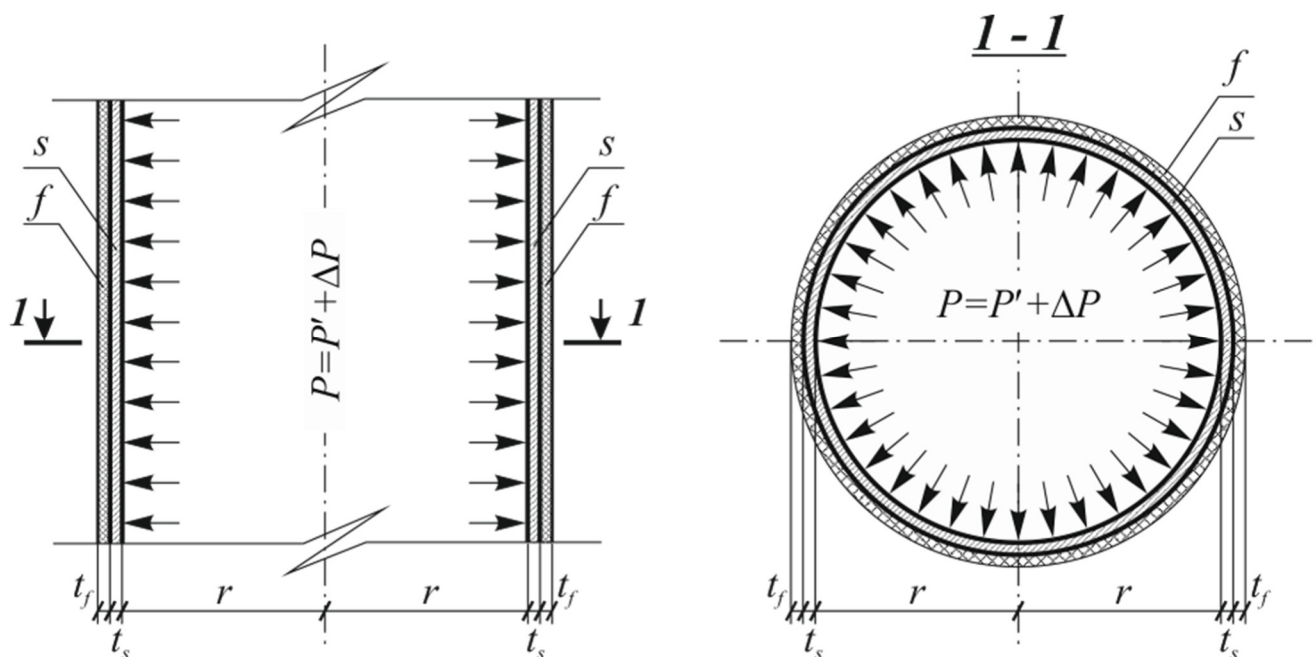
Calculation drawing of a steel cylindrical shell of a tank reinforced with external transverse FRP: s – the steel shell of the tank, f – the layer of external transverse FRP reinforcement
